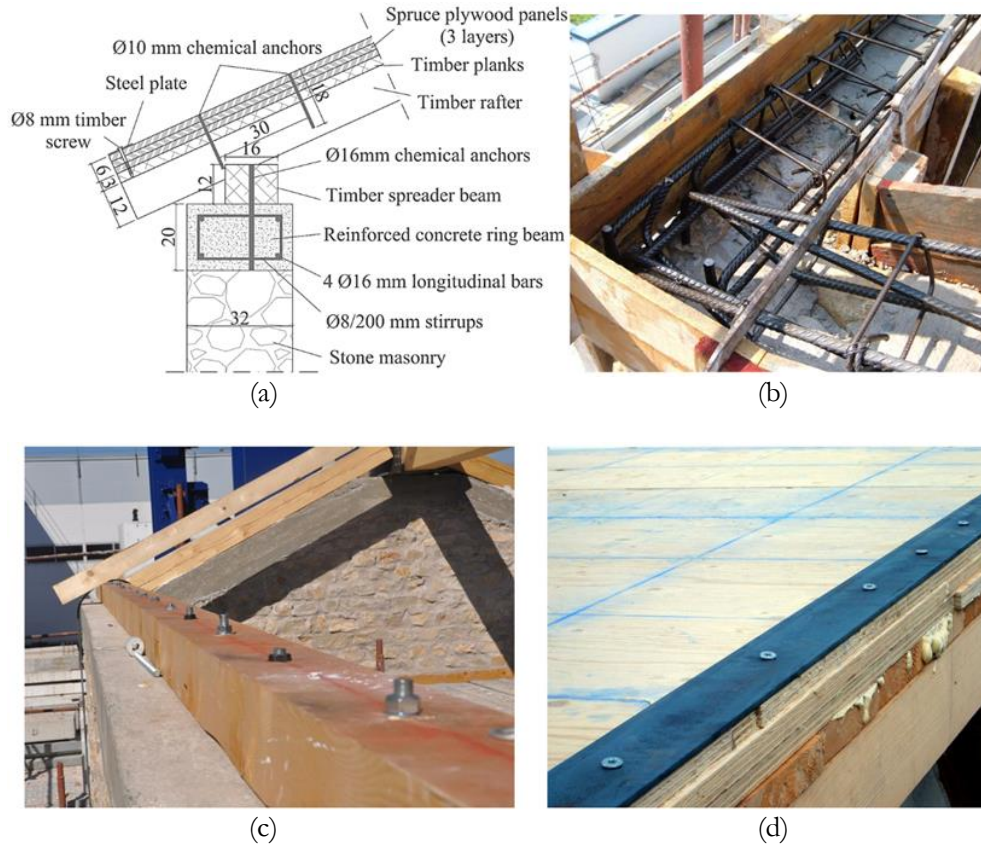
Building 3, retrofit at the roof level: (a) structural detail of the RC ring beam; (b) ring beam reinforcement at corner; (c) timber spreader beam connected to the RC ring beam above a longitudinal wall; (d) spruce plywood layers and continuous steel plate along the perimeter. Units of *cm*.
